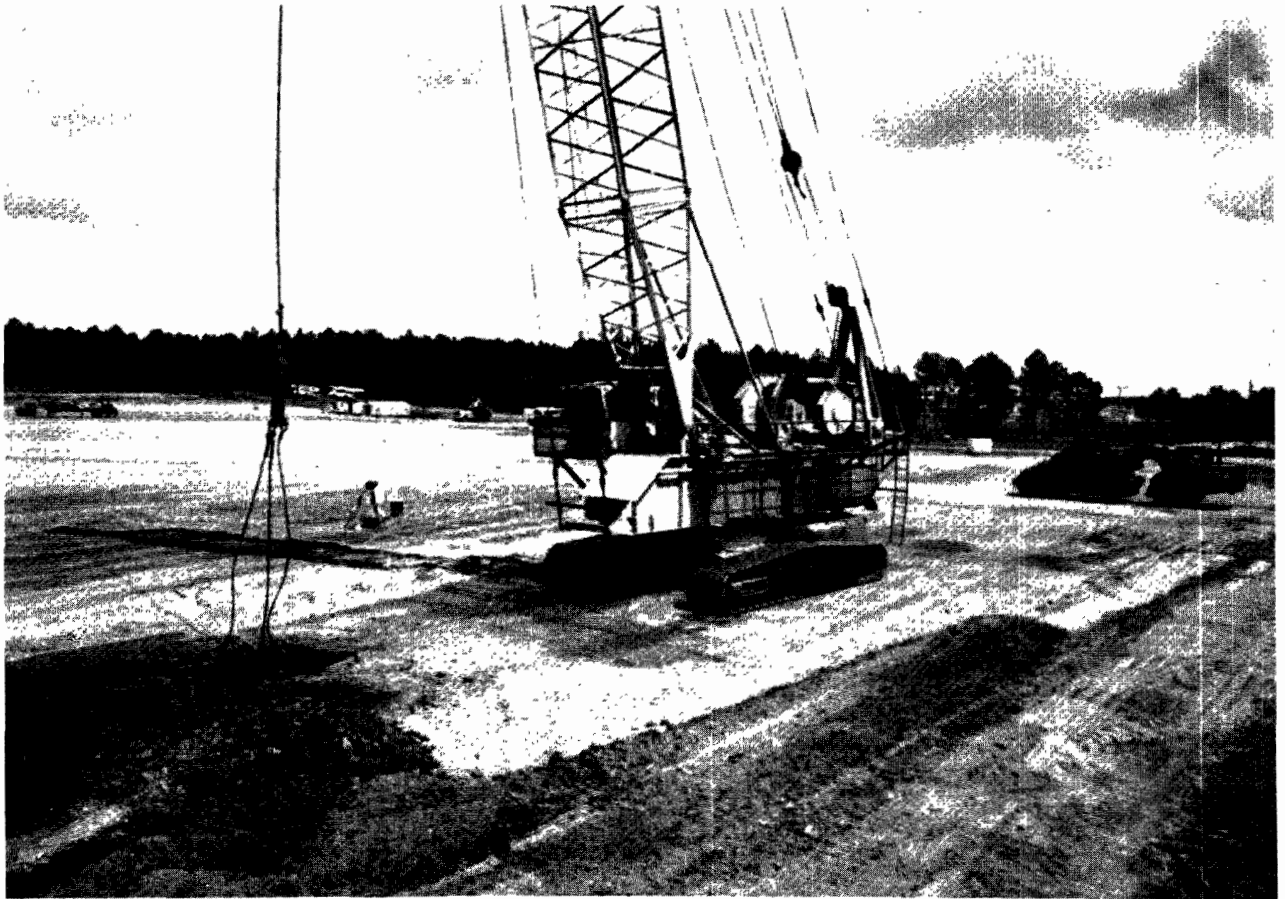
LDC-350, "Thumper" and Elevating Scraper Hauling Crater Backfill, Mixed Waste Management Facility, DOE, Savannah River Plant
